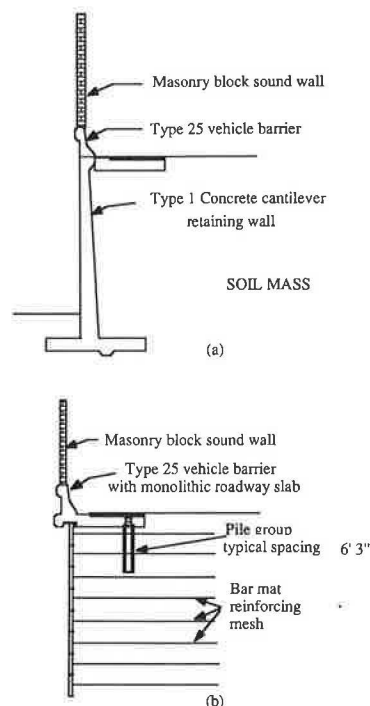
a, Type 1 retaining wall; b, MSE retaining wall.
